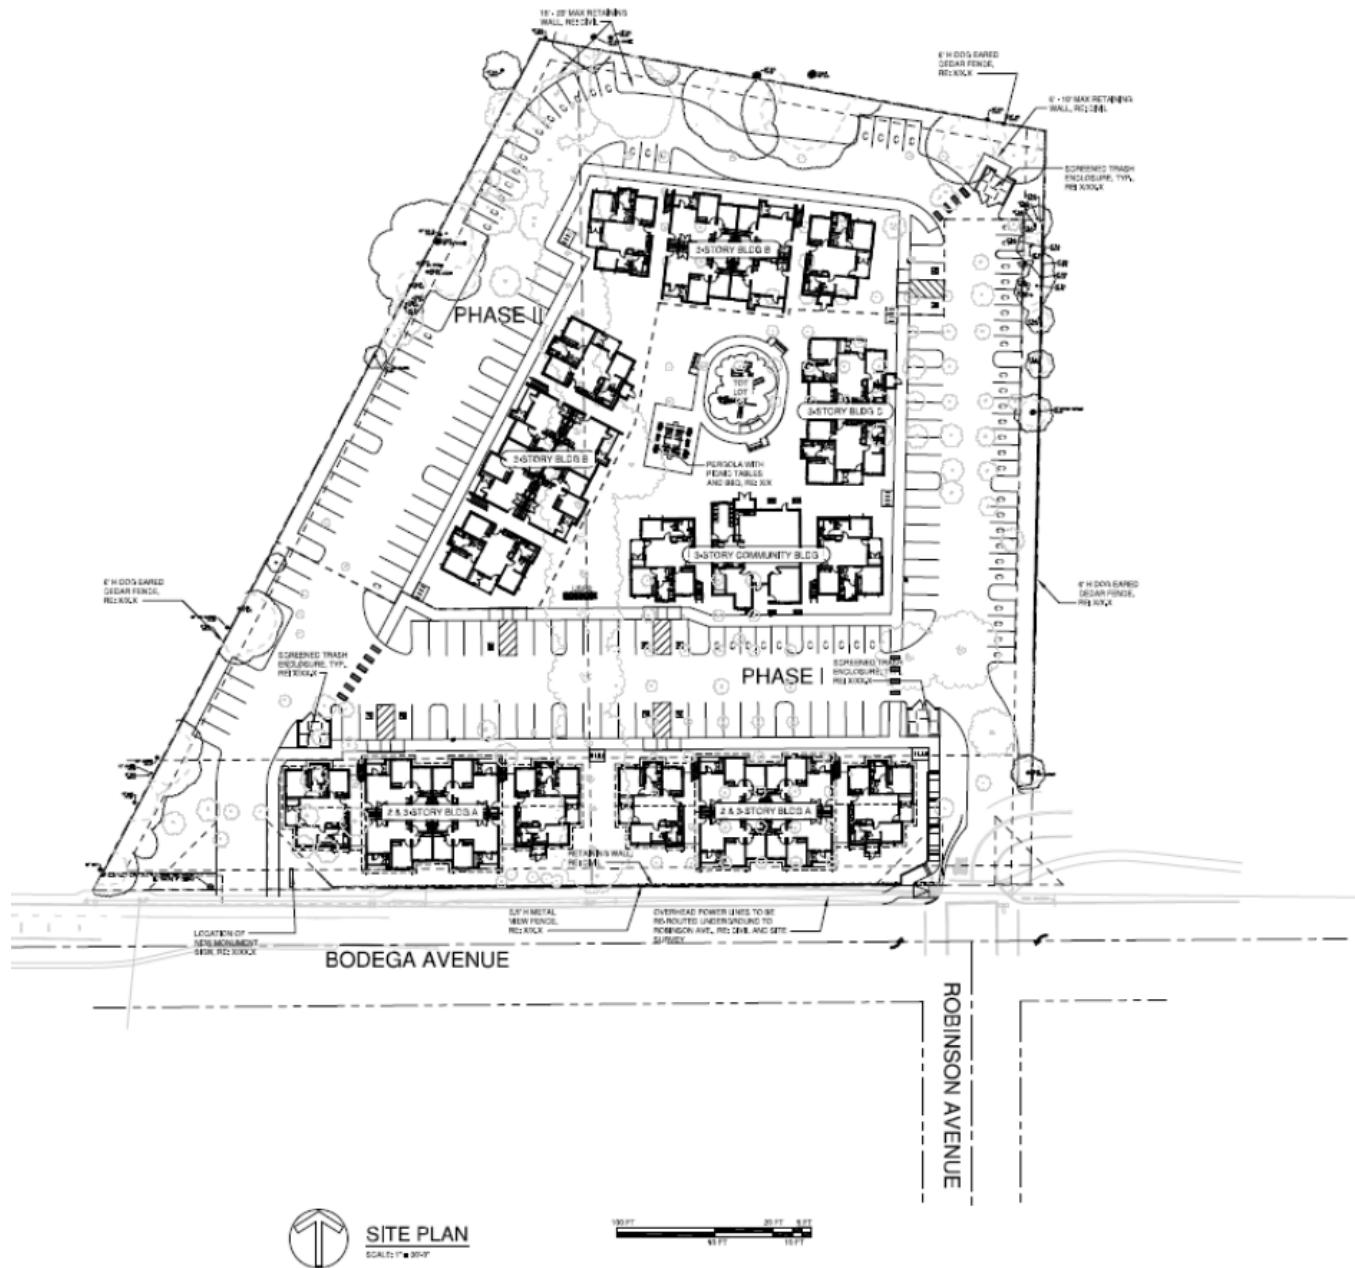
WOODMARK APARTMENTS SITE PLAN
